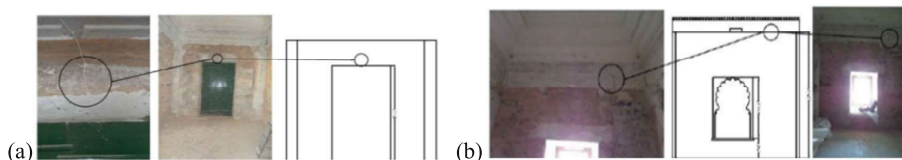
Defect examples: (a) cracks: center of top beam (b) opening of joints: side walls
